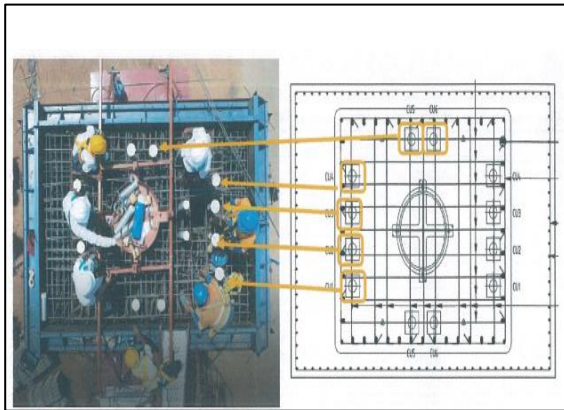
Project location simulation in the planning of concrete cast for slab structure
